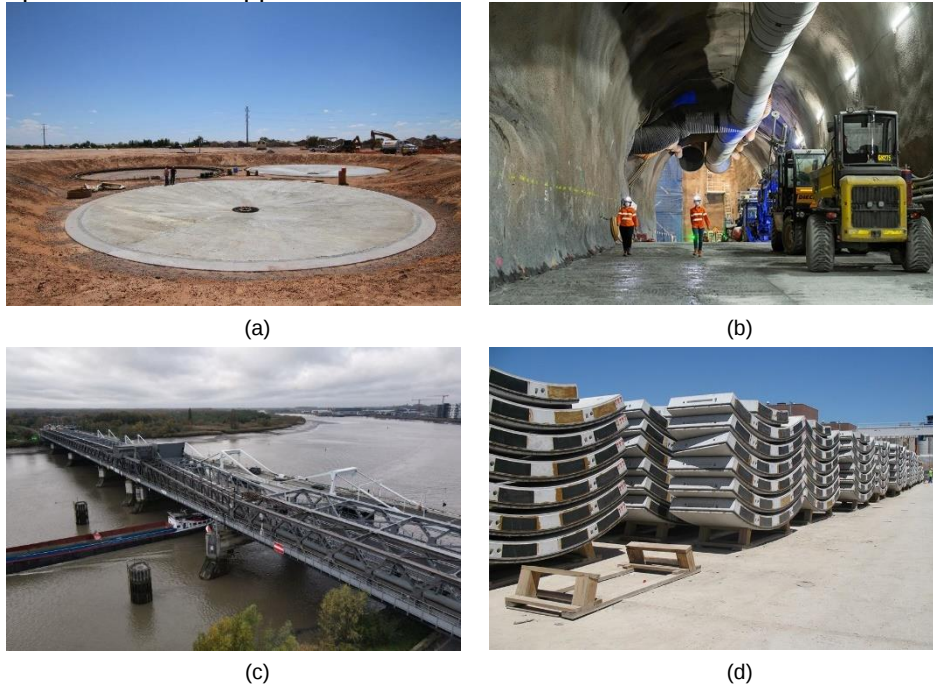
MSFRC applications: (a) General paving for Palo Verde Wastewater Reclamation Facility Expansion, in USA; (b) Shotcrete ground support for Brisbane Cross River Rail Shotcrete Lining, in Australia; (c) Concrete topping for Scheldt Bridge, in Belgium and (d) Segmental lining for Pista Nueva Malaga Rail Tunnel project, in Spain [103].
